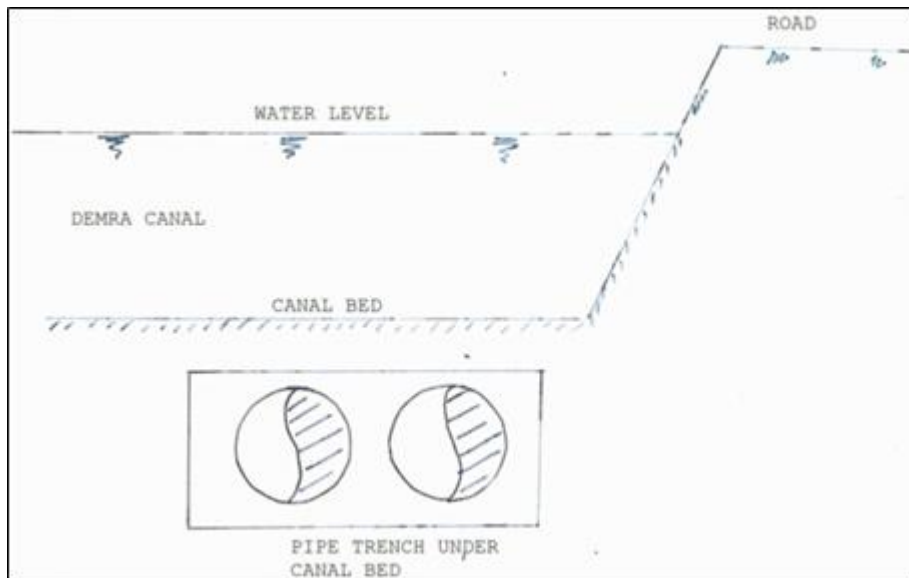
c: Indicative Arrangement of Pipe Installation Under Demra Canal Bed
